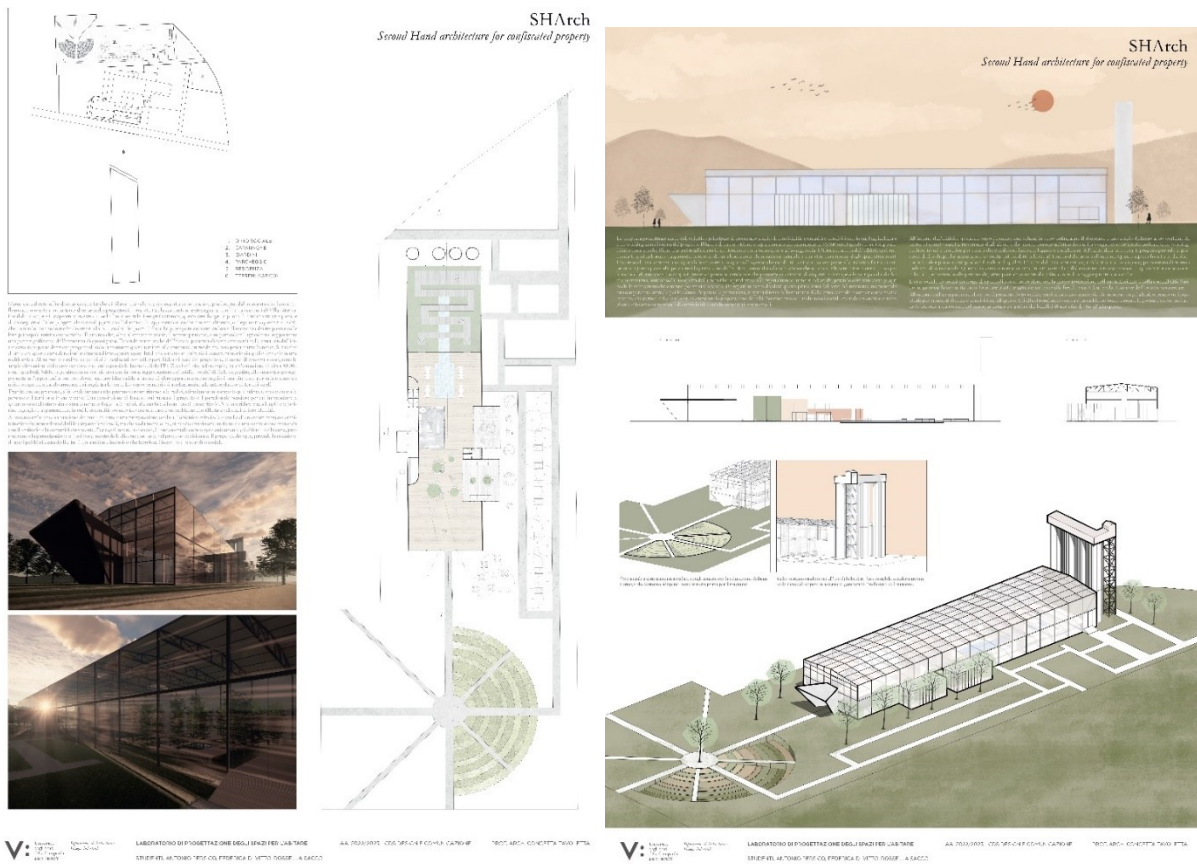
4. P A New Green Wild. Project plan, renderings and drawings.
